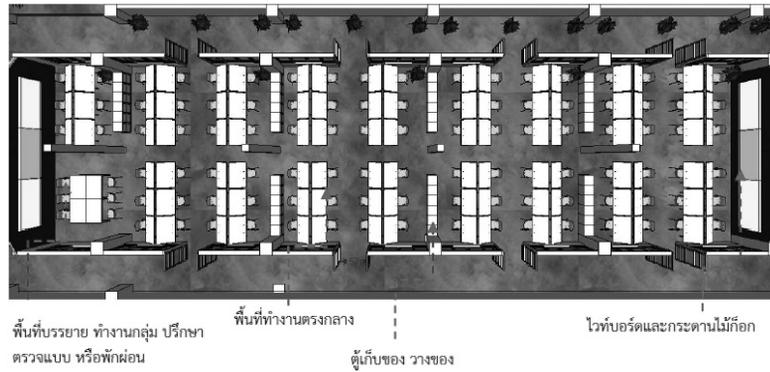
Furniture lay out AR-508 (Floor 5) studio type 3
